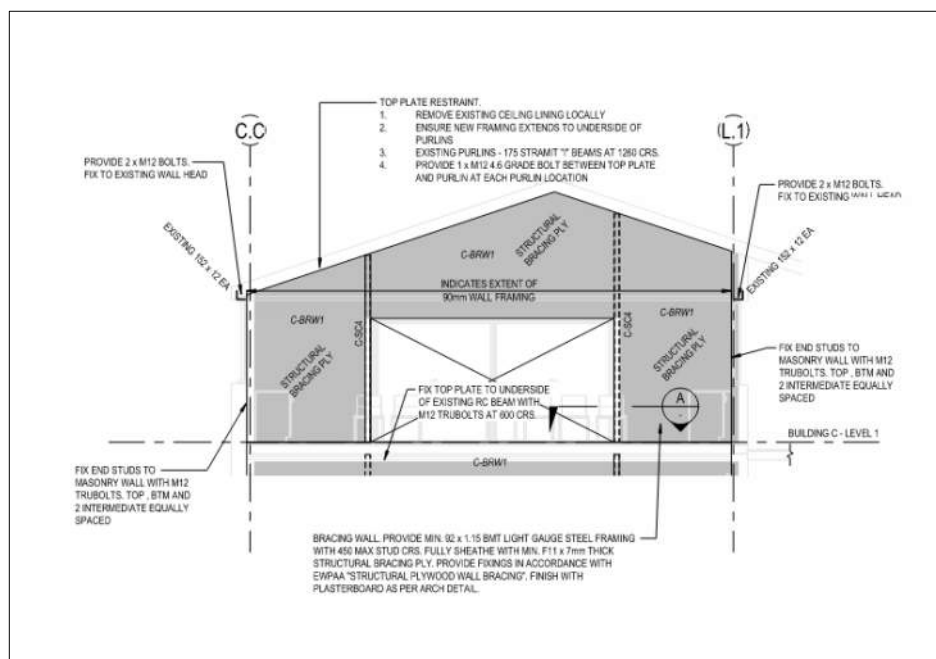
Original Brace Wall taken from KHS-S-C-04.00 Issue 2
